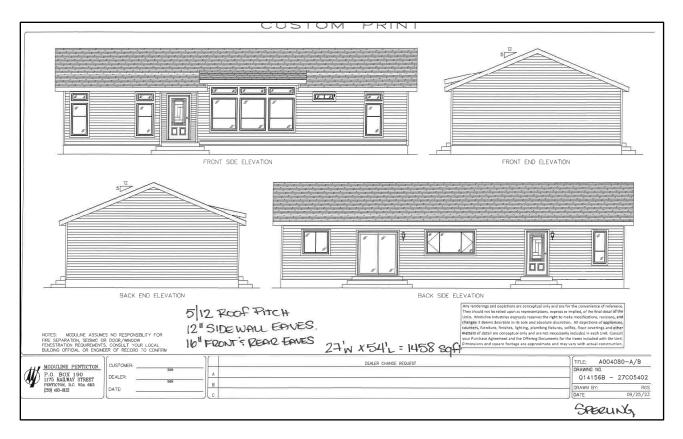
Proposed Accessory Dwelling Unit Elevations
